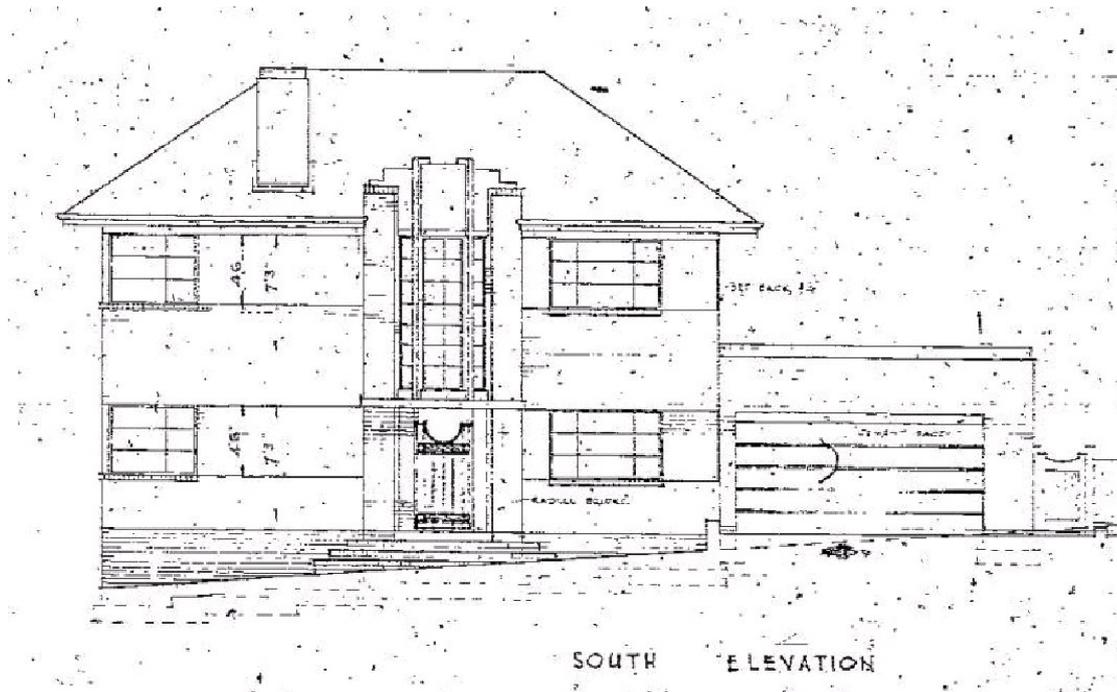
The south elevation, facing Yarrbat Avenue from the original house plans. Note the single-storey form of the garage. (Source: City of Boroondara Building Permit 10142, dated 11 August 1938)
